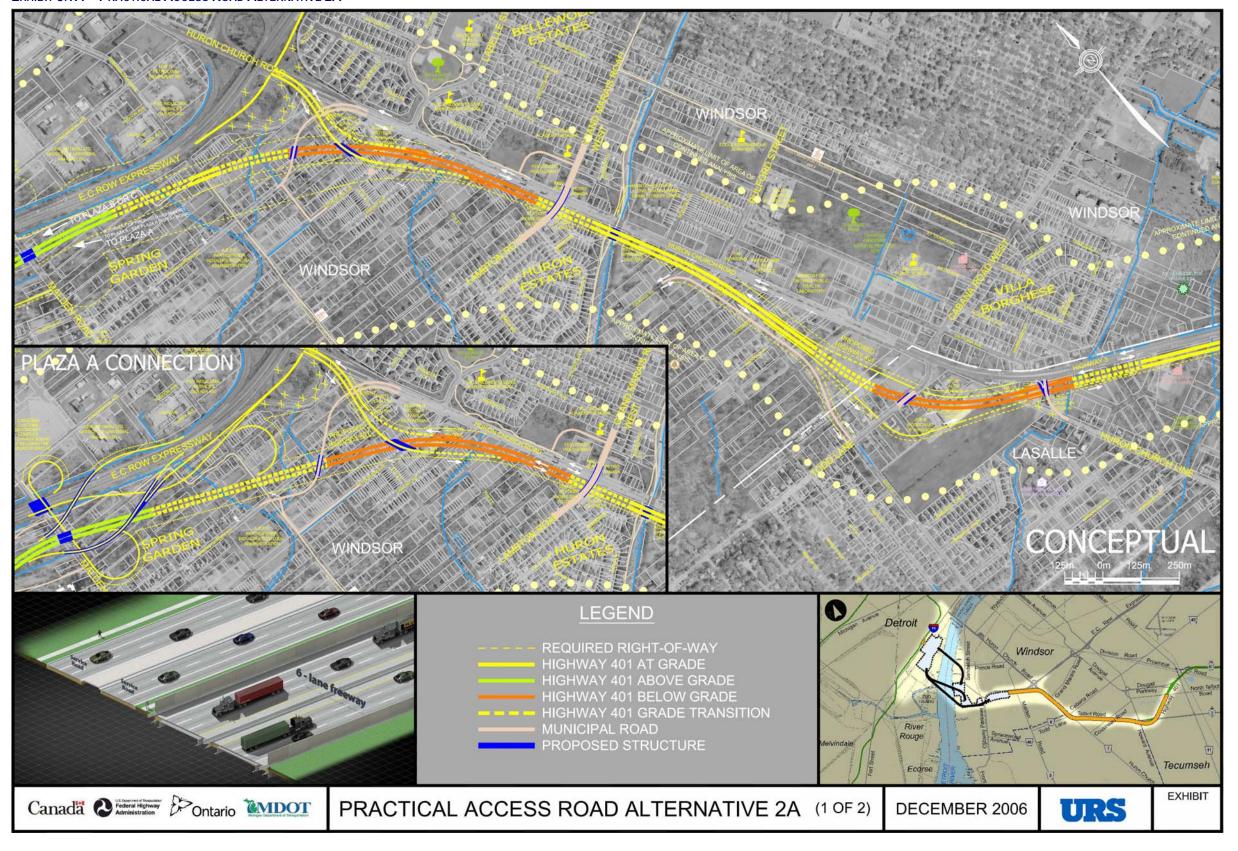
B – PRACTICAL ACCESS ROAD ALTERNATIVE 2A
